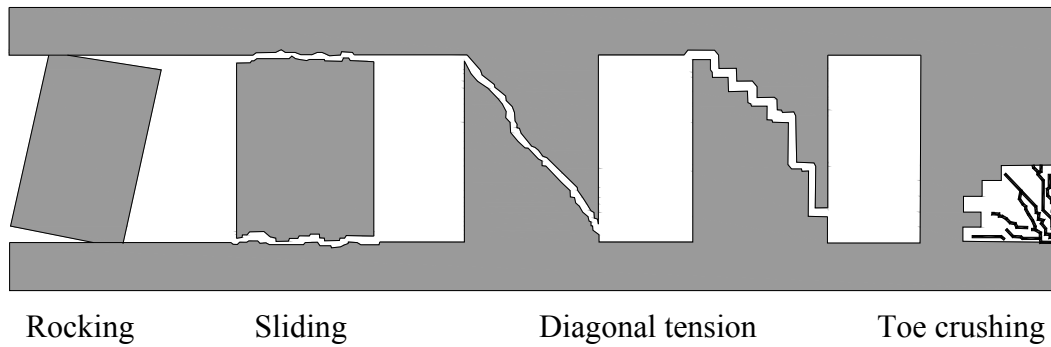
In-plane collapse mechanisms of the piers (adapted from Yi 2004).
